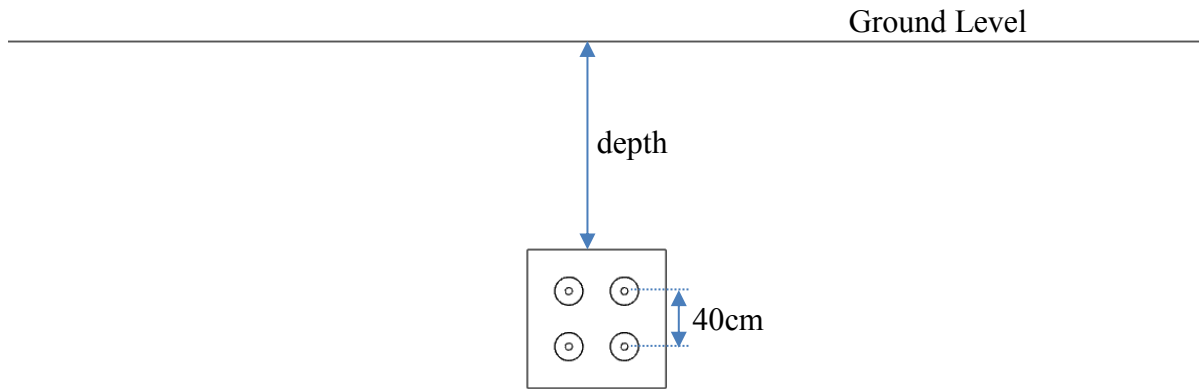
Typical cross section of a 230 kV underground cable circuit.
